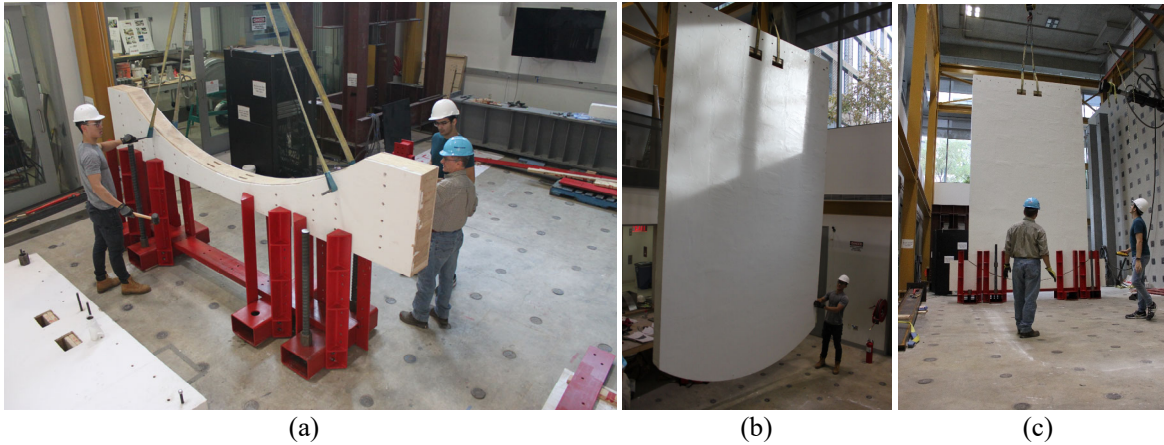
Construction Phase for the X-Braced Wood Panel Shear Wall Test Setup
